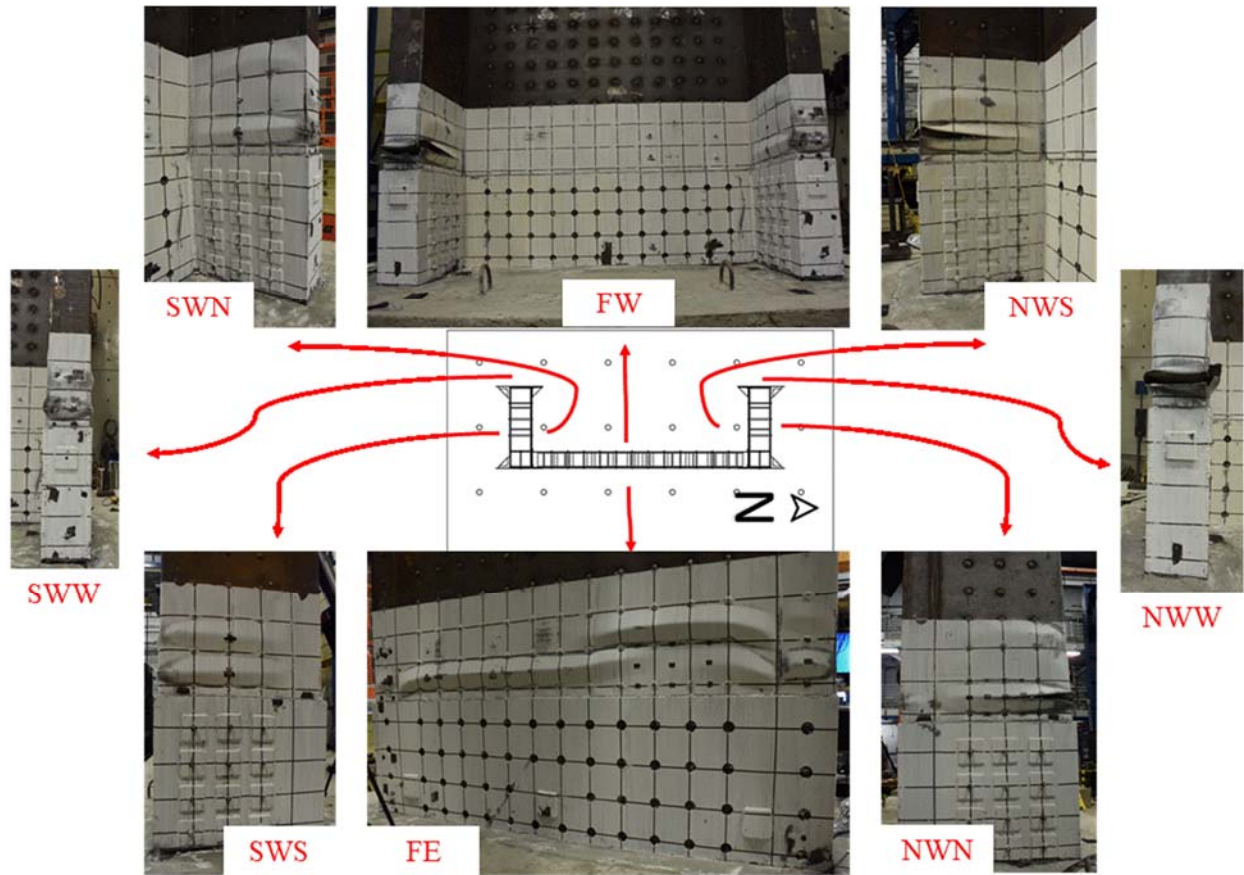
Post-test damage inspection of the wall steel plates for Repaired Specimen C2
